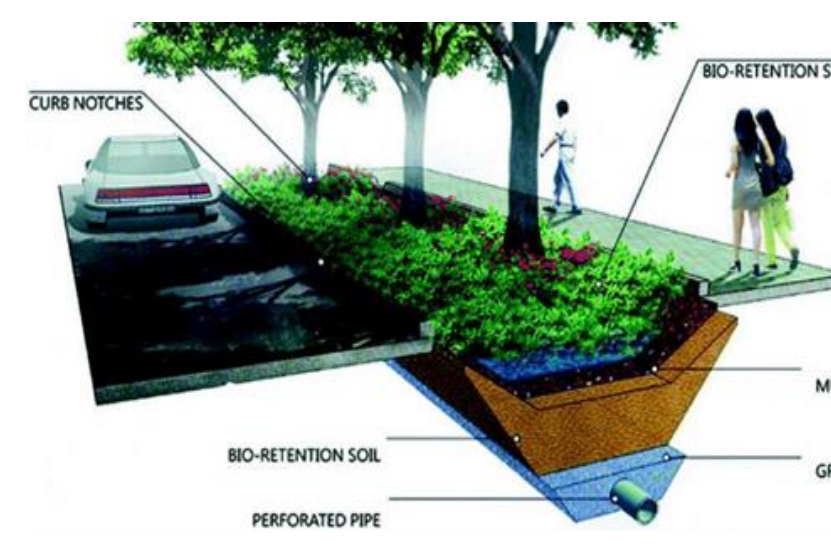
Greenery and filter strips at streets and general public space - Greenery besides public streets and permeable pavements & parking lots can be used to hold back stormwater or infiltrate it into the ground. Furthermore, cleaning is done by the natural layer and the plants contribute to the climate, clean air etc.
